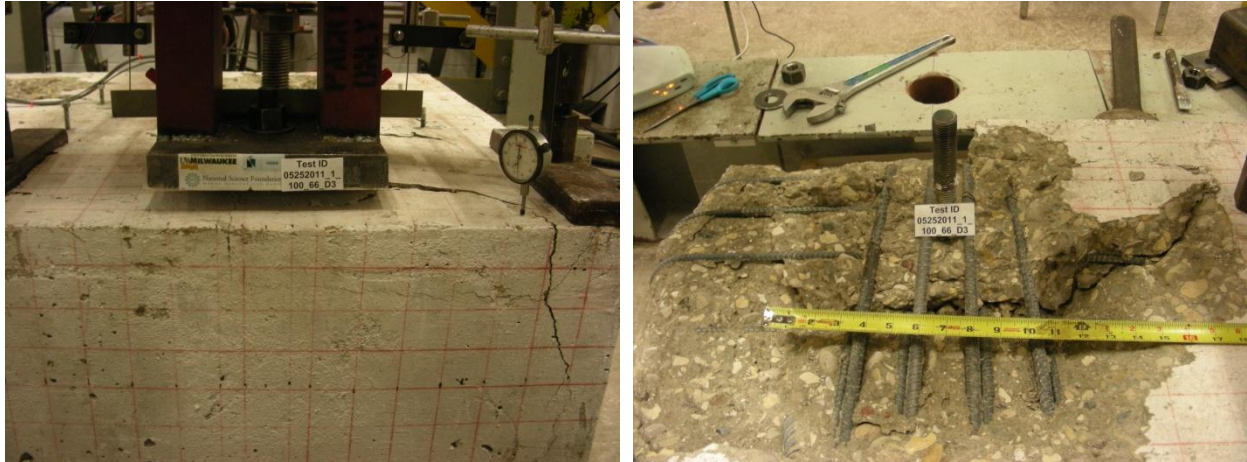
Failure of 1.0-in. anchors with Type E reinforcement under monotonic tension
